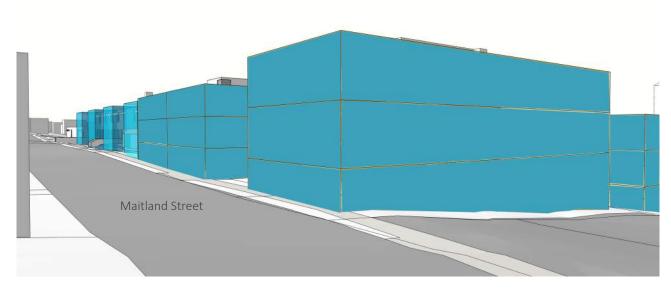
Possible buildings on the site with shared and public open spaces (By: Iyad Al-Halis - CEU)
